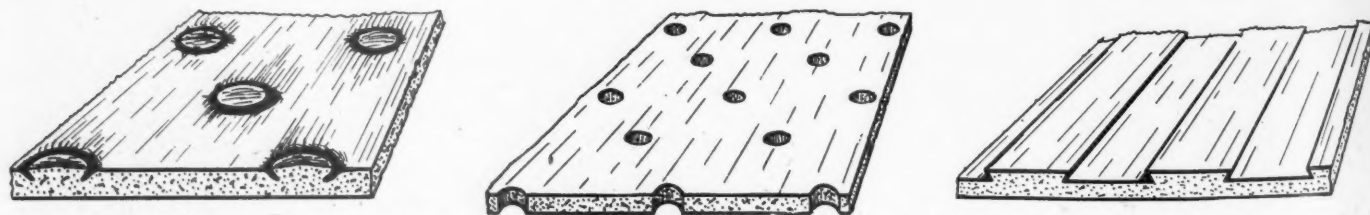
Types of specially formed board surfaces for giving a mechanical key in addition to the natural bond between the board and plastering
